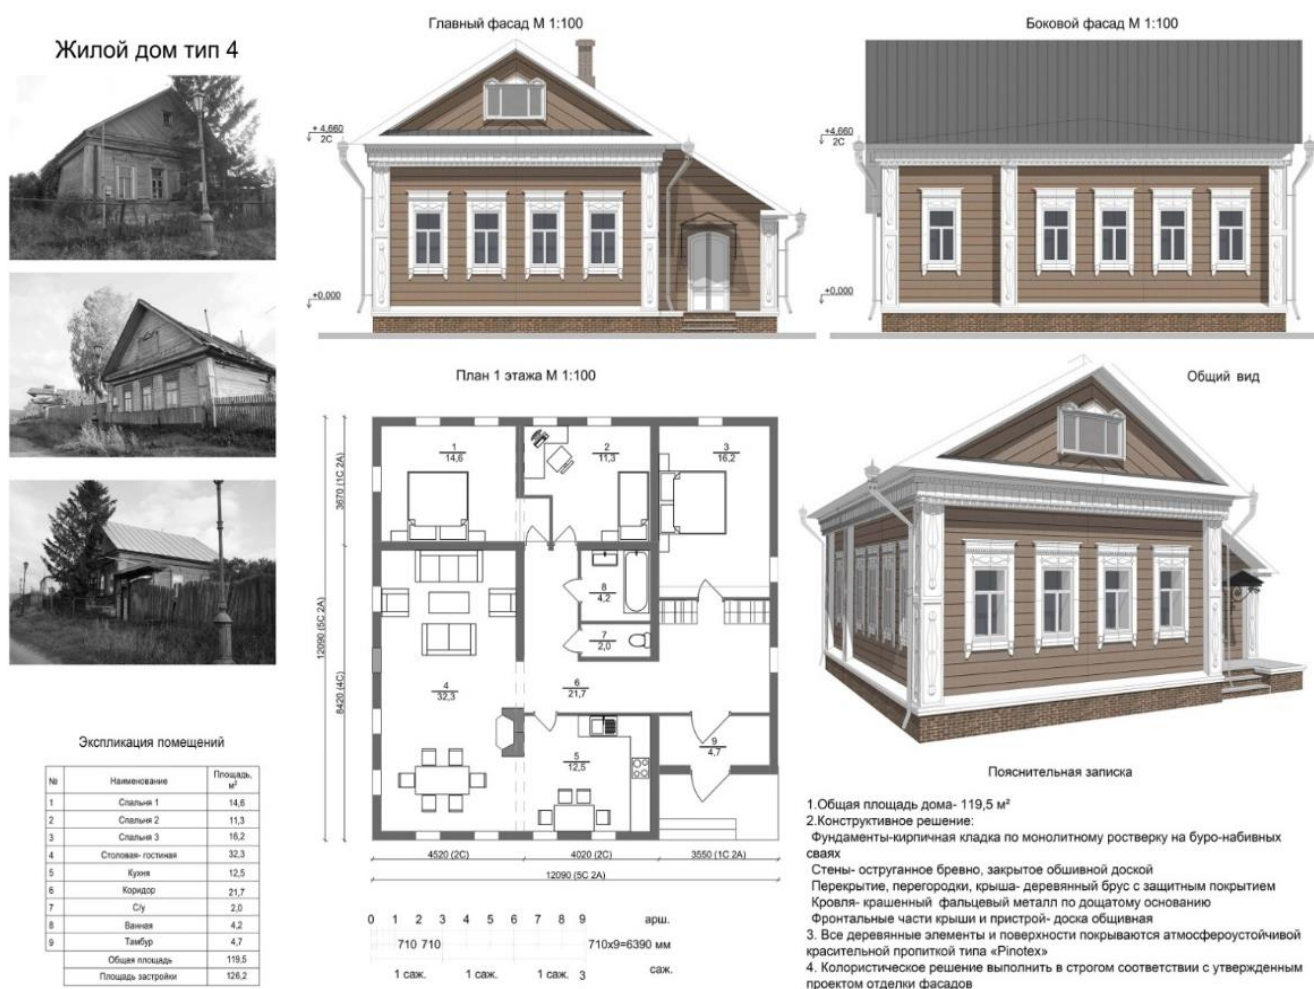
Model House Type 4: one-storey residential building with main façade with 4 windows: main façade, side façade, plan, and general view. The total area of the house is 120 sq.m.
